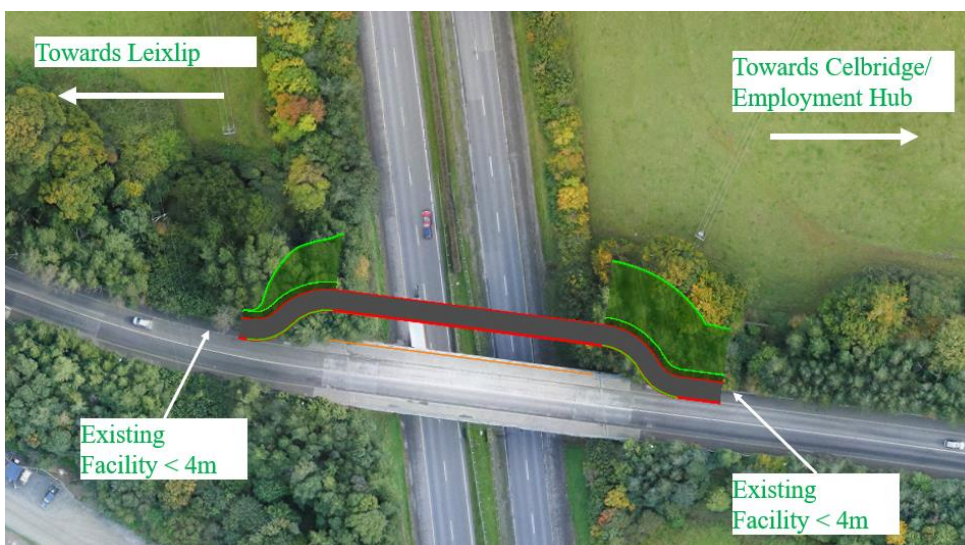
Option 2 - Active Travel Overbridge east of the R404 Celbridge Road Overbridge
